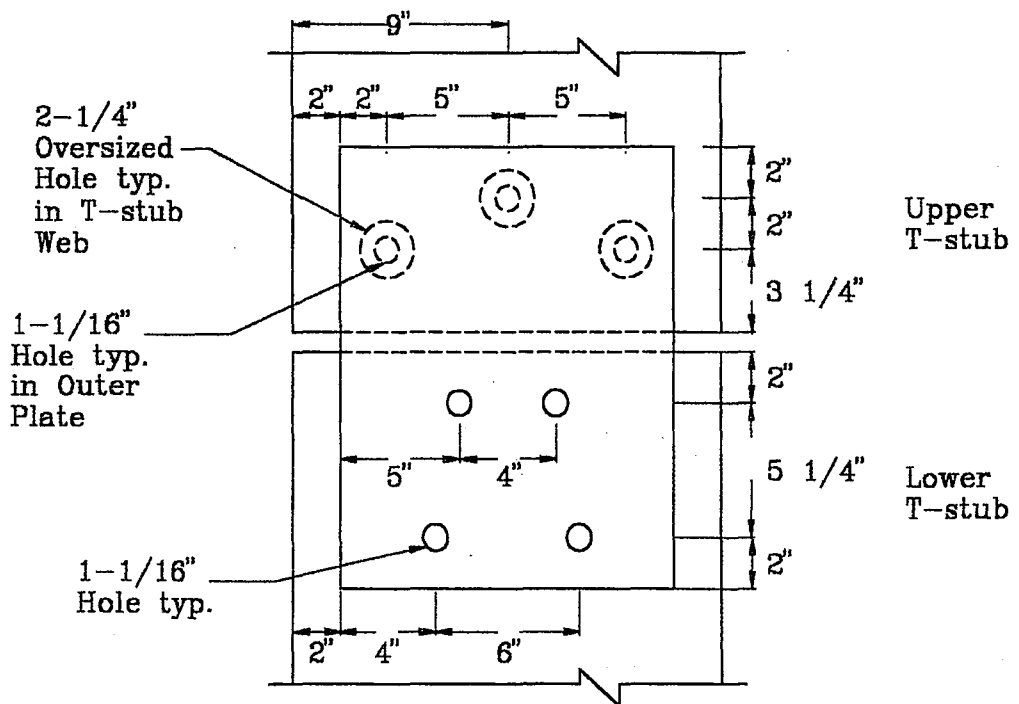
Double Plate Test Specimen Bolt Pattern
